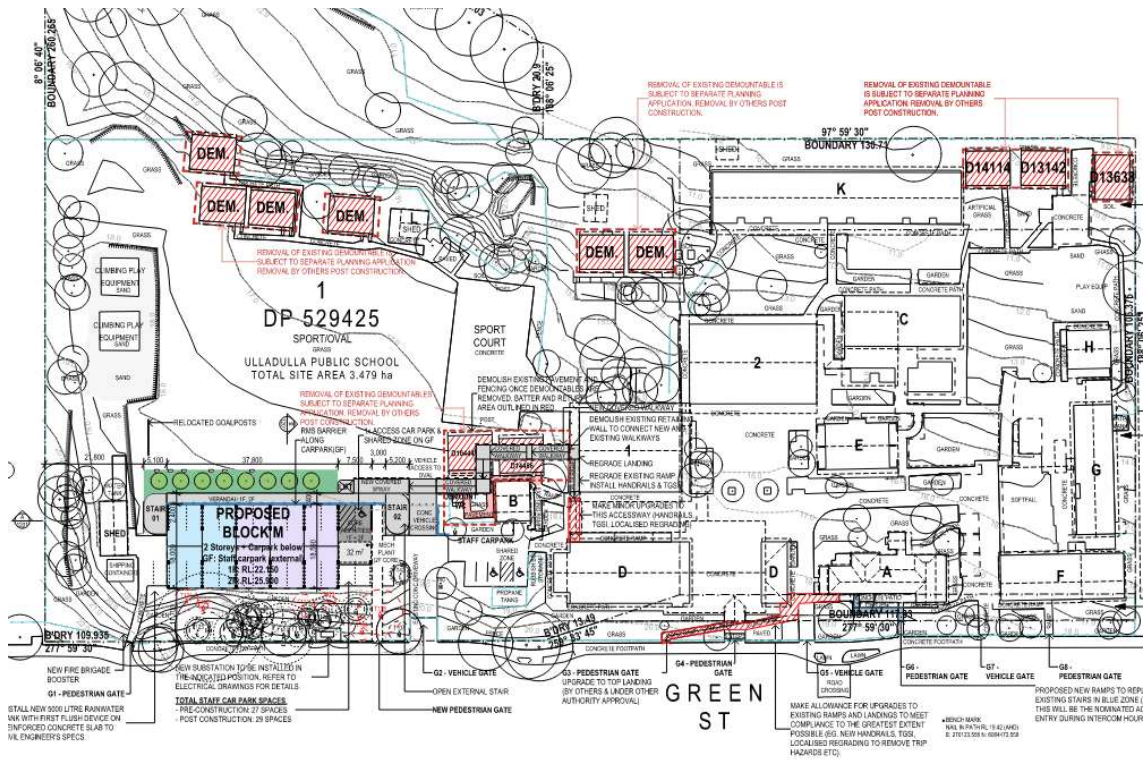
Site Plan (Source: Fulton Trotter, 2025)
